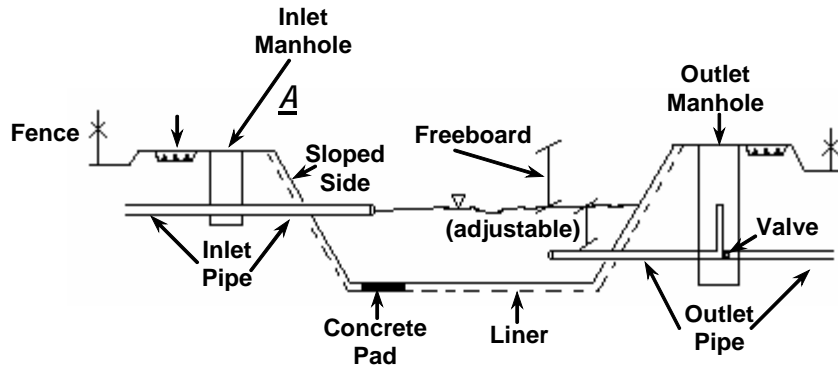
Typical lagoon design. [From Wastewater Stabilization Ponds, 1981]
